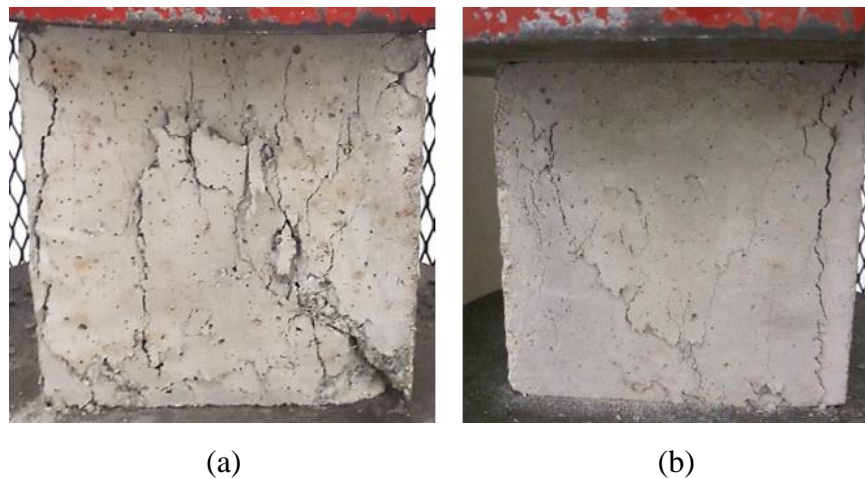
Crack Pattern of Concrete Cube Specimens under Compressive Test: (a) Plain Concrete; (b) Steel Fibre Concrete
